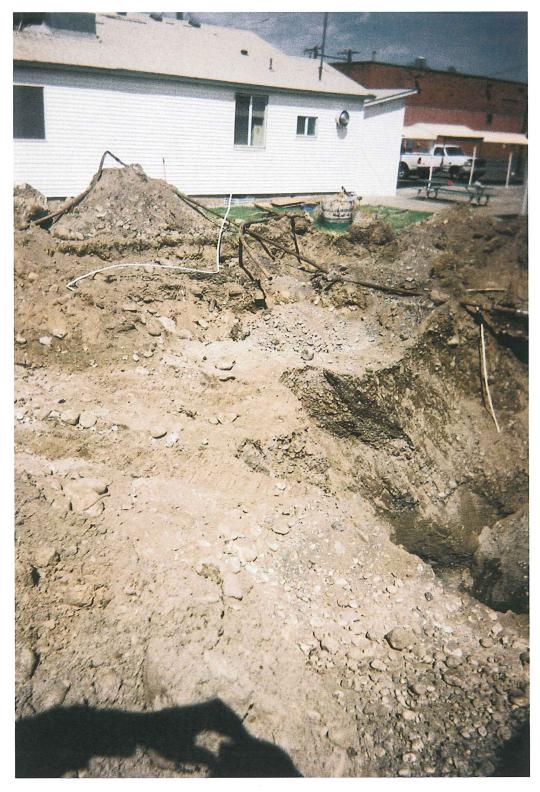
LOOKING NE ACROSS FINAL EXCAVATION
